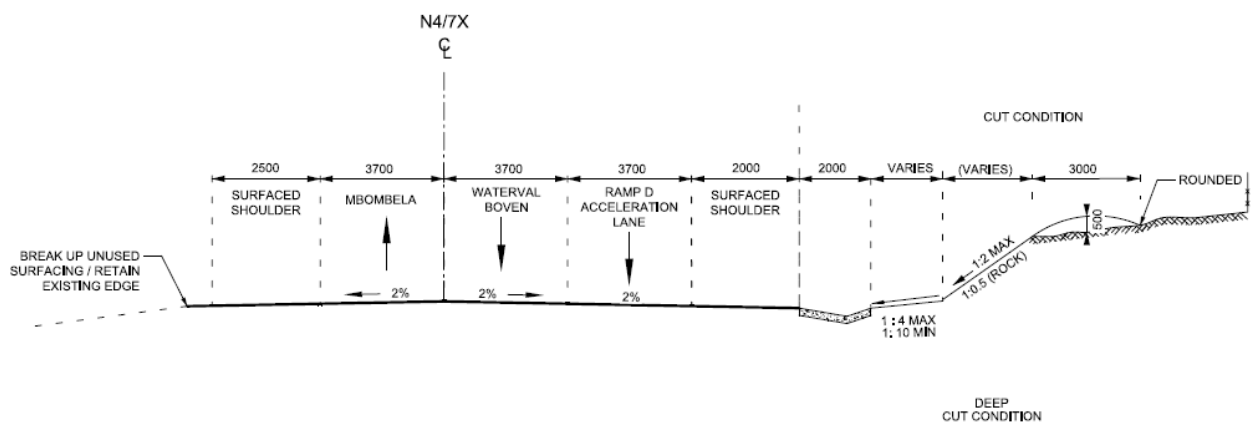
Typical Cross Section N4-7X South Of Crocodile River Bridge
